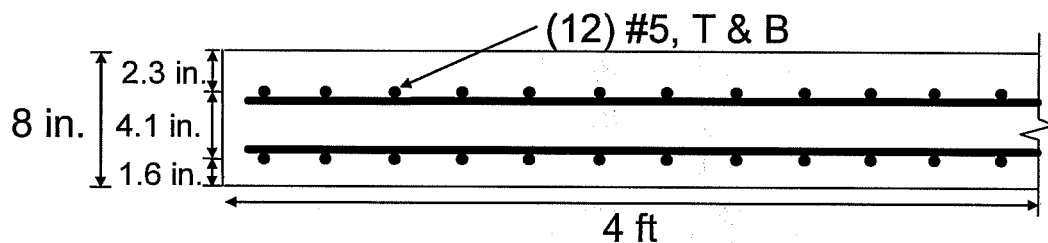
Cross-section of UTSE detail (Ryan 2003)
